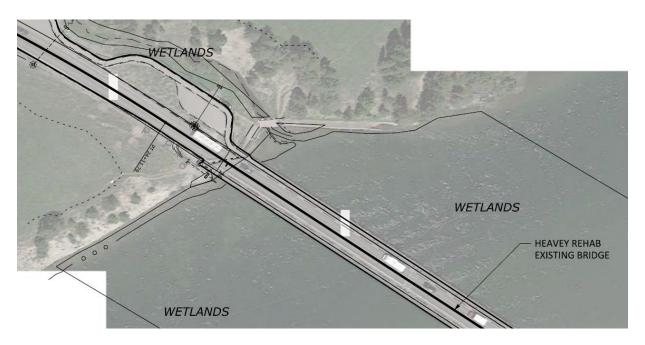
Alternative B (Expanded View, Fishing Bridge, West Side)
